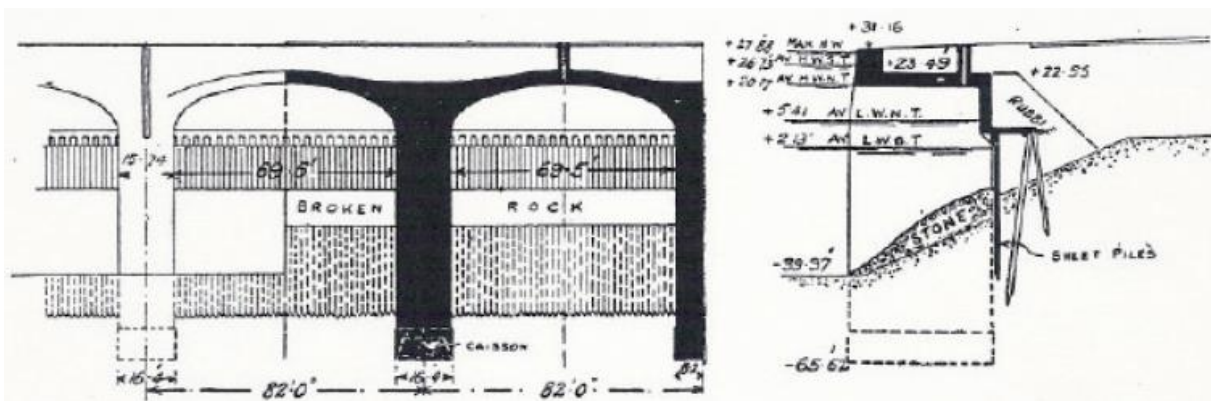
Front view and cross-section of the quay wall in the port of Le Havre [Gijt, 2010]
